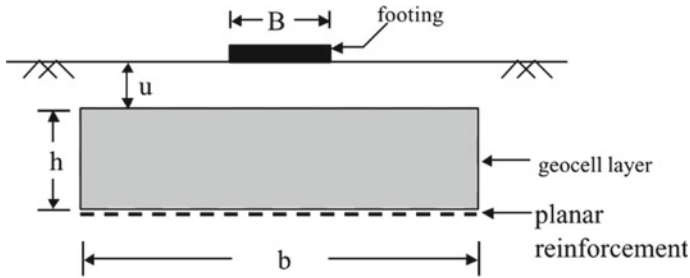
Sectional view of geocell–basal planar reinforcement in the shallow foundation [10]
